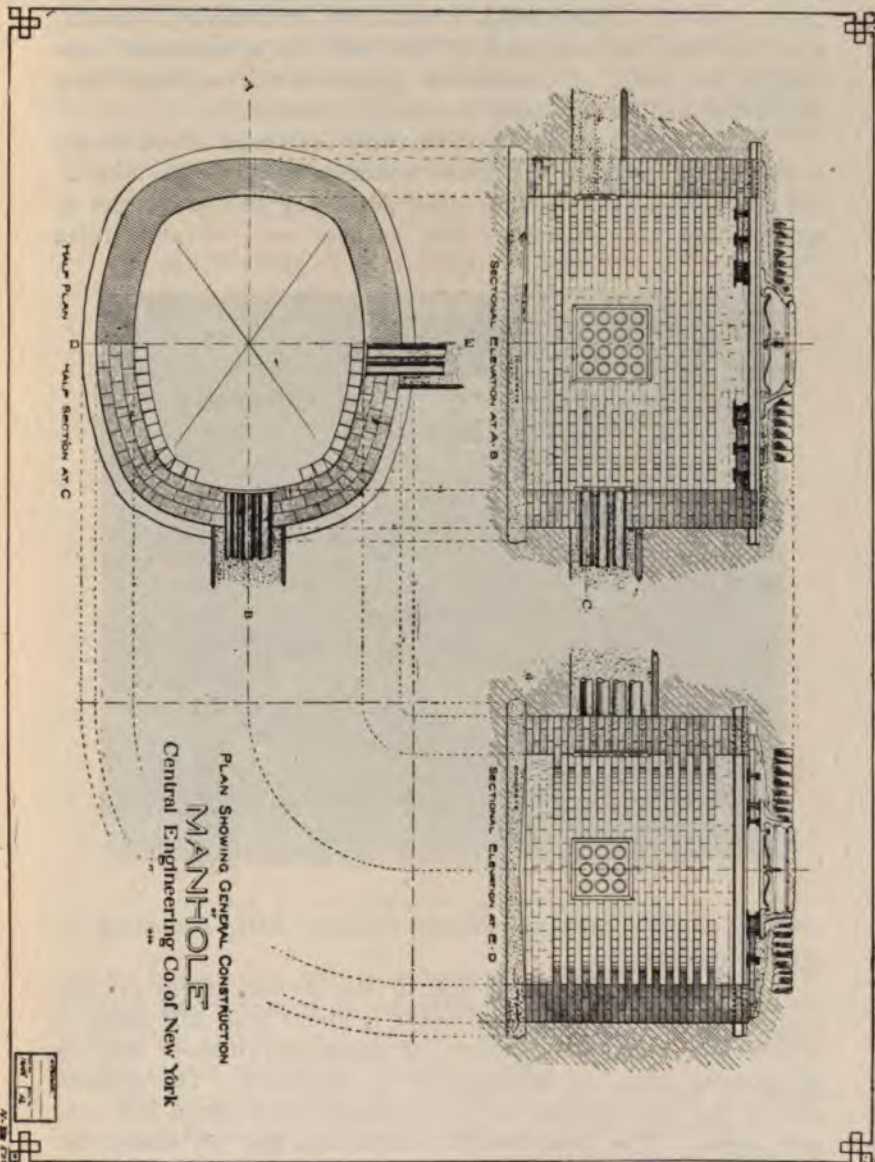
GENERAL MANHOLE CONSTRUCTION
